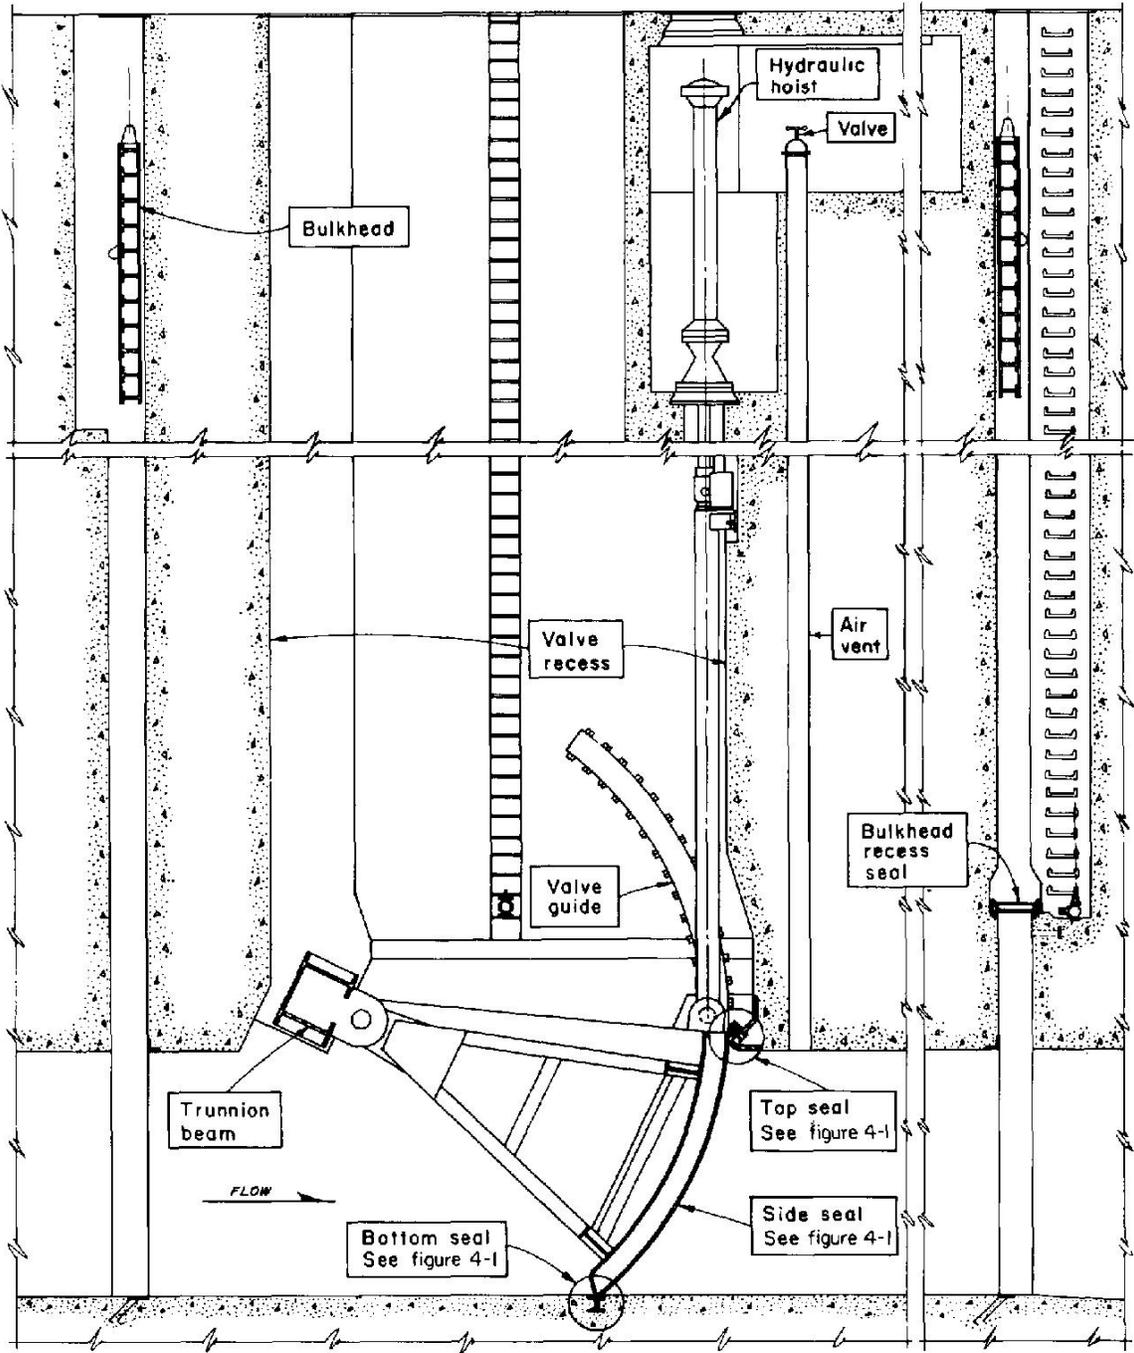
Elevation view of typical reverse tainter valve machinery hoist.
